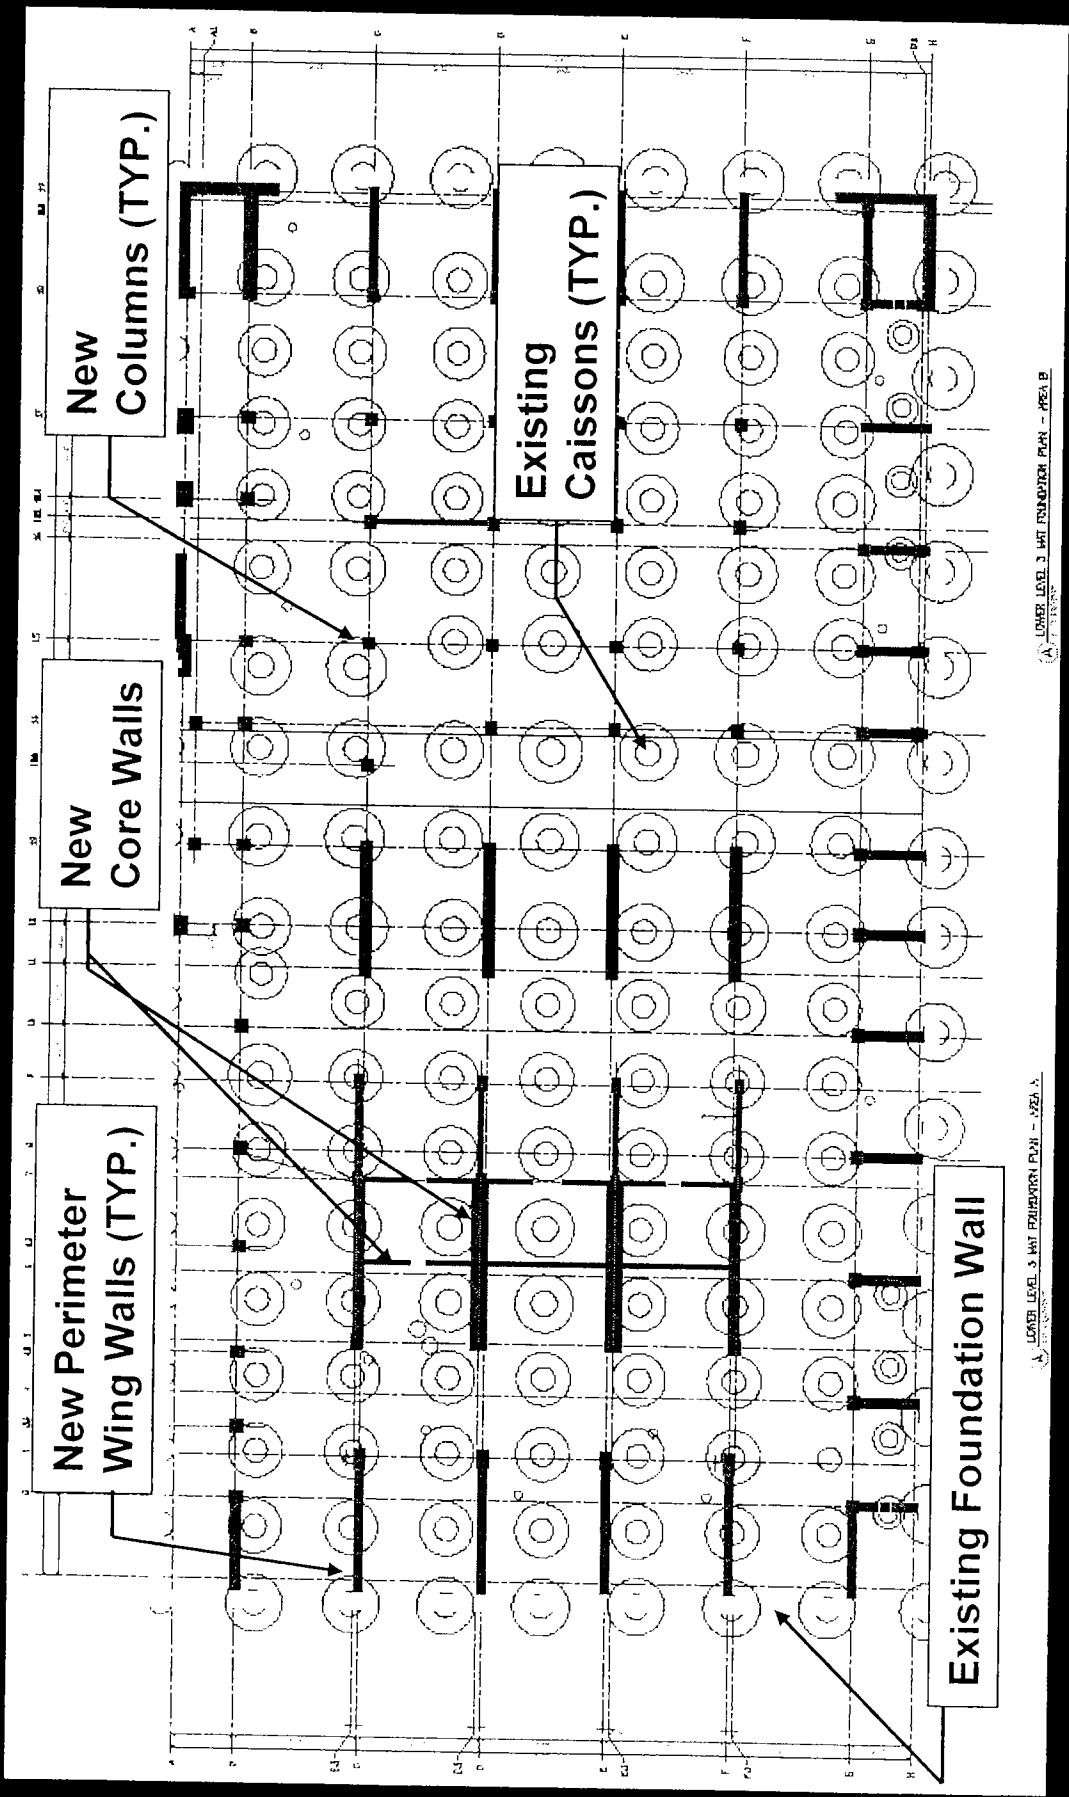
DEARBORN CENTER FOUNDATION PLAN
